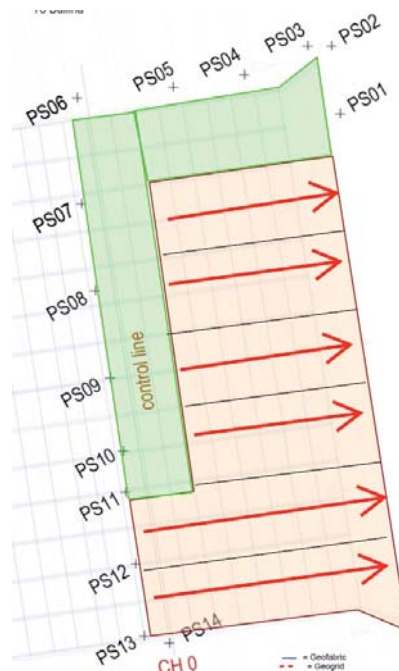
Prism (PS01 to PS14) locations and recommended slot excavation (arrow shows excavation direction, green area backfilled with gravel foundation)
